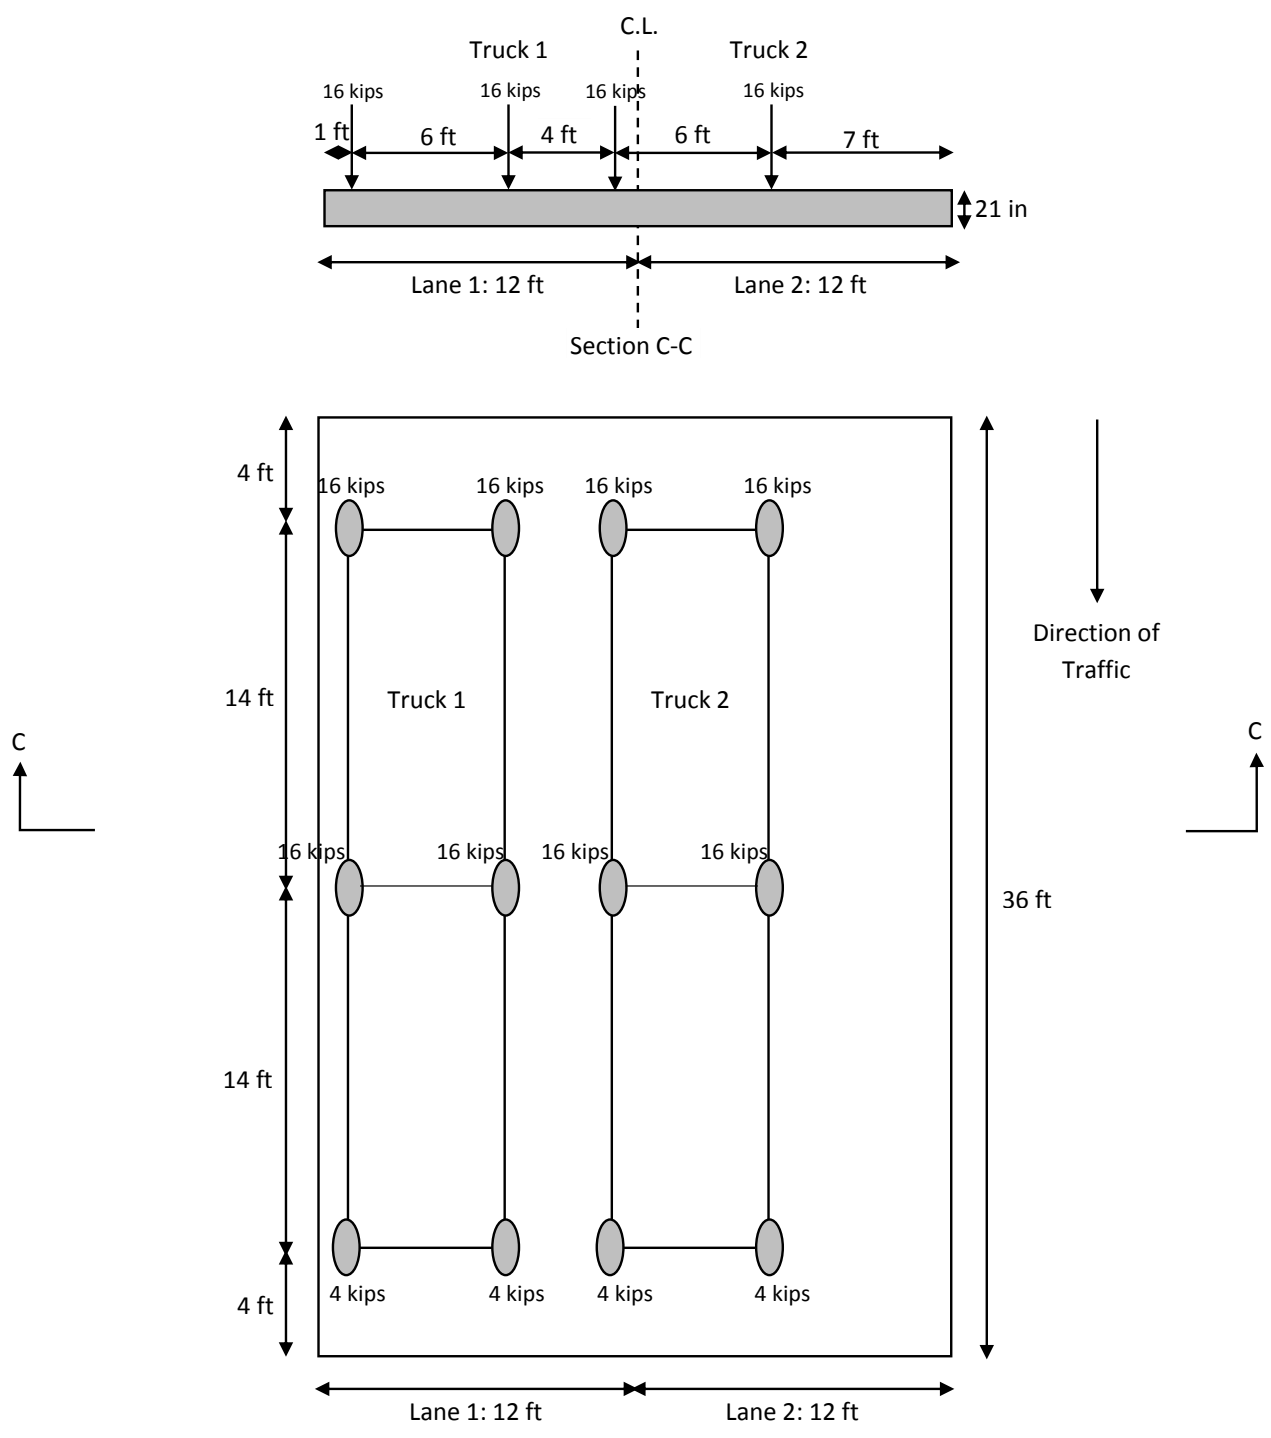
Typical Cross-Section and Plan of Two-Lane 36 ft Span Bridge under Edge Loading Condition.
